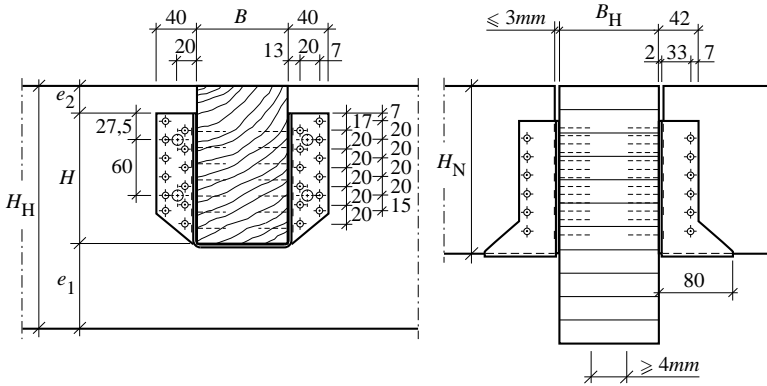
Joist hanger for a header-joist connection. (STEP 1995 Article C13)
